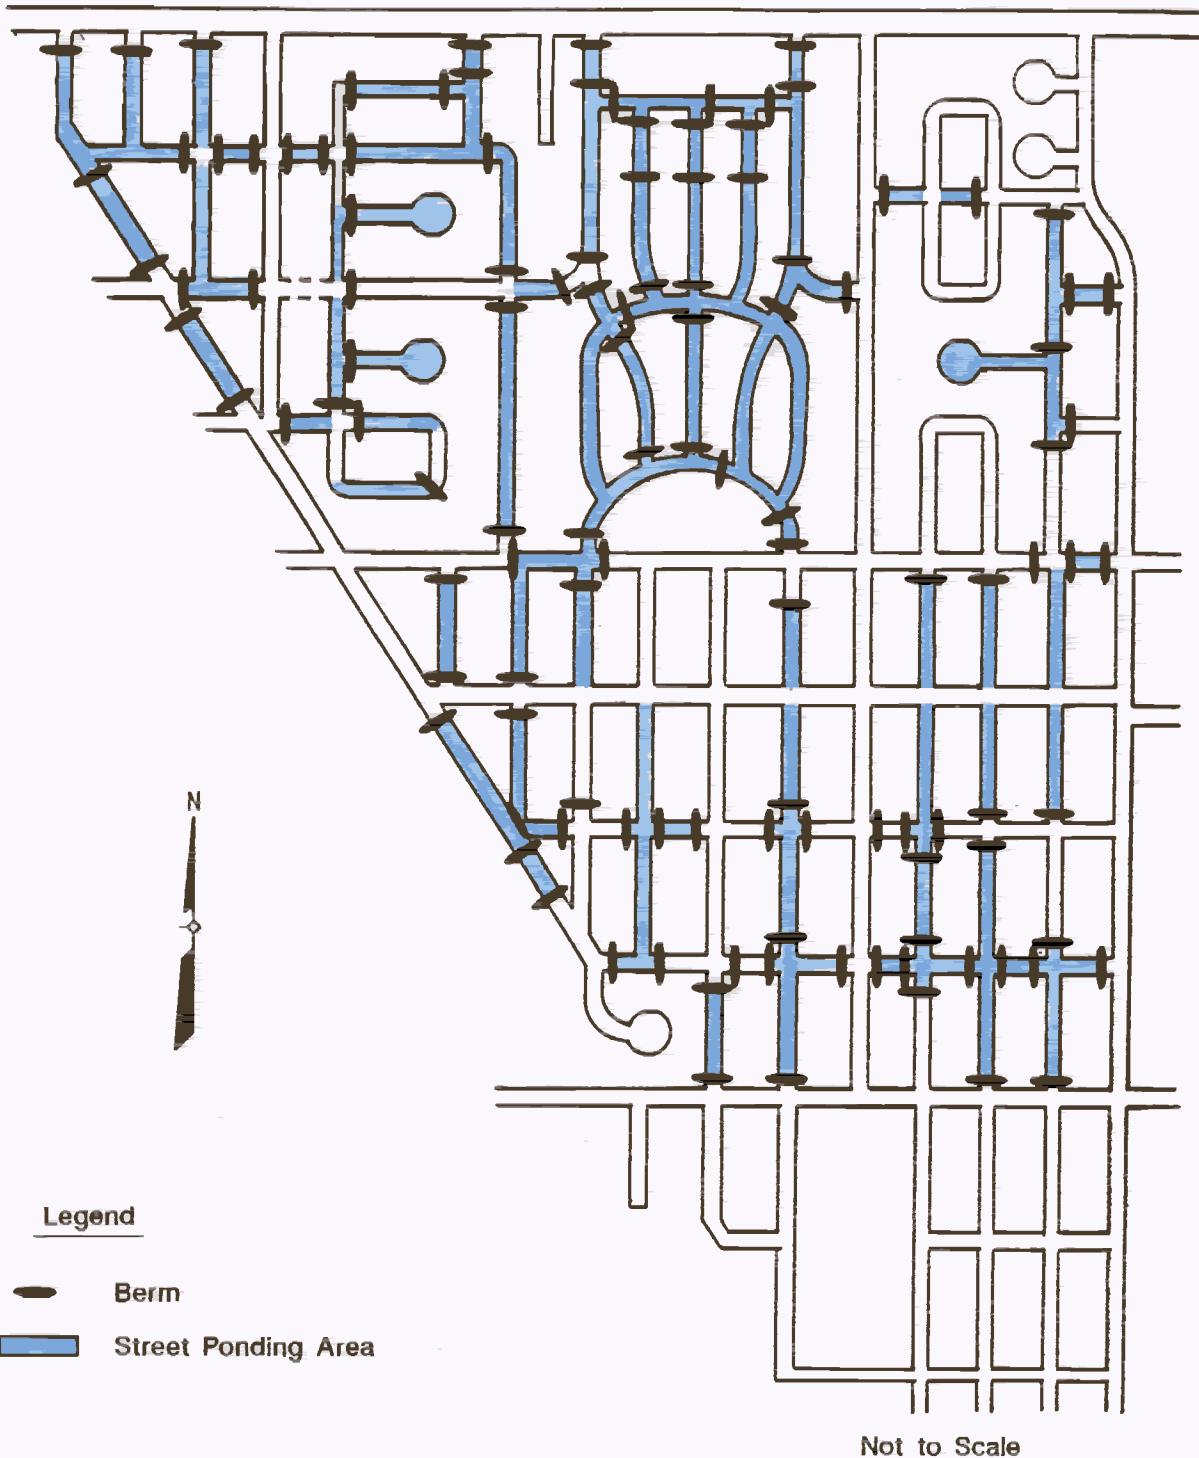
Street storage system proposed for the Jeffery Manor neighborhood in Chicago, IL (Source: SEC Donohue, 1993, p. 5-3).
